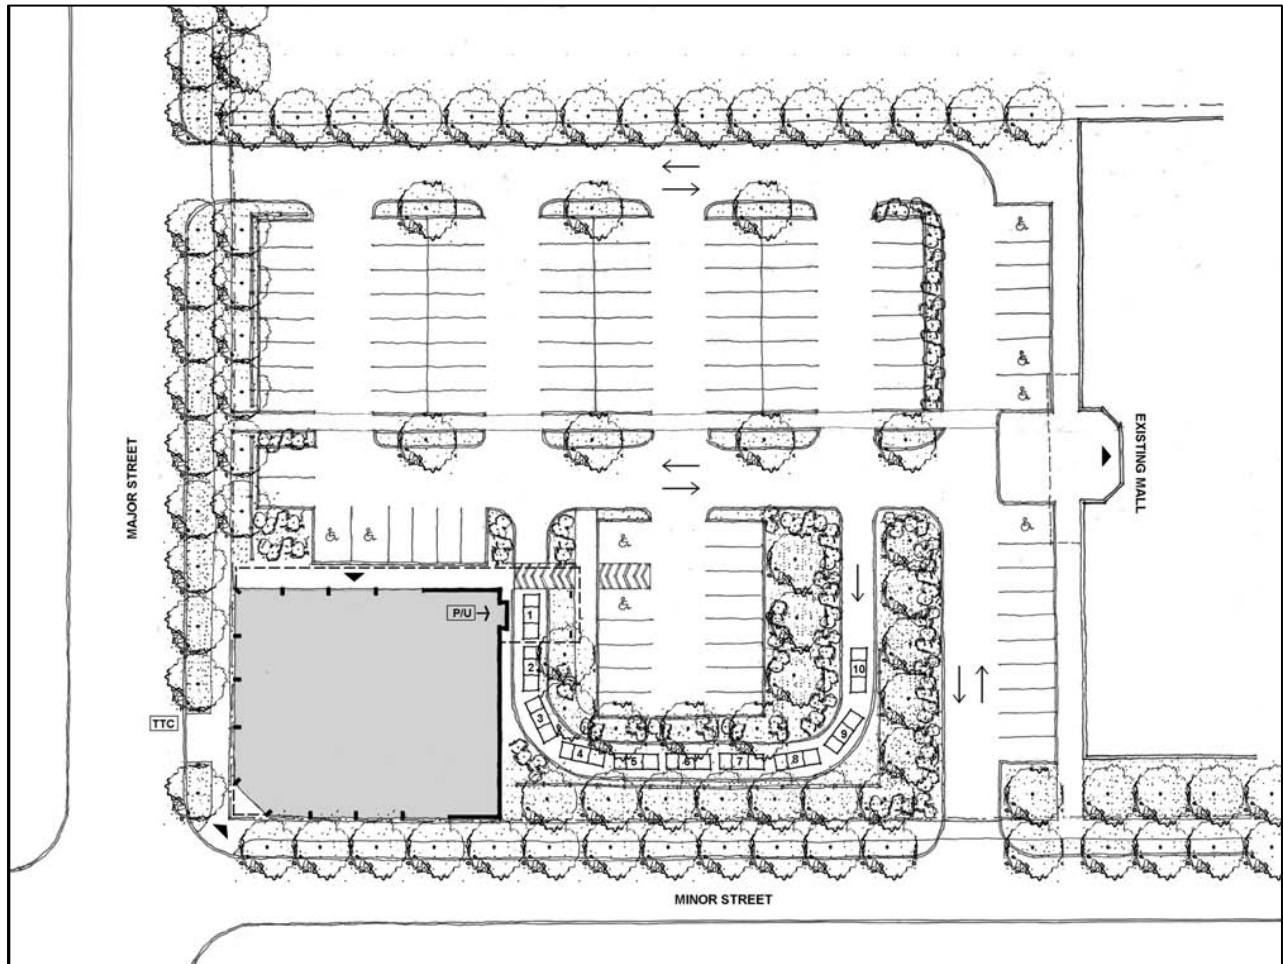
All loading and unloading of drive-through facilities should be accomplished on-site. Drive-through entrances, exits and stacking lanes should be contained within the interior of the site.
